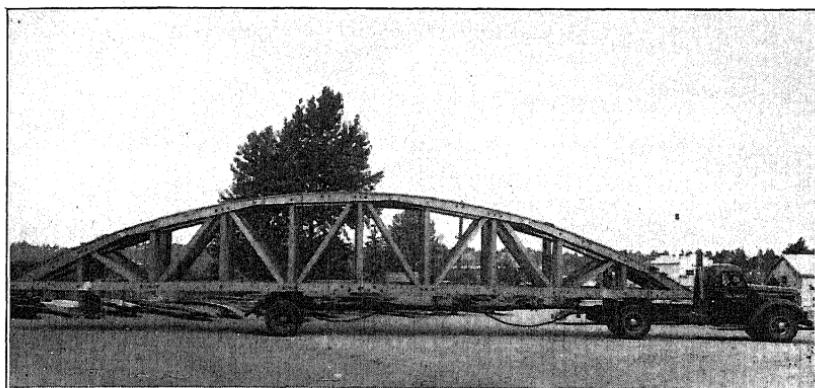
Modified arch type bowstring truss being transported by specially built truck.
